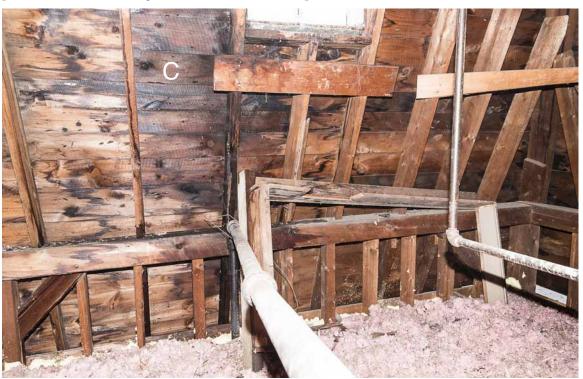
Attic space on the south side of the center tower room looking at the sheathing on the front (east) pitch of the roof with window #49 in the upper center. This photo was taken the same day as #87. The wet area at "C" is from the flashings on the east side of the dormer roof of window #49. Like the leaks in photo 89, they only occur a few times a year and do not appear to be affecting the floors below.
